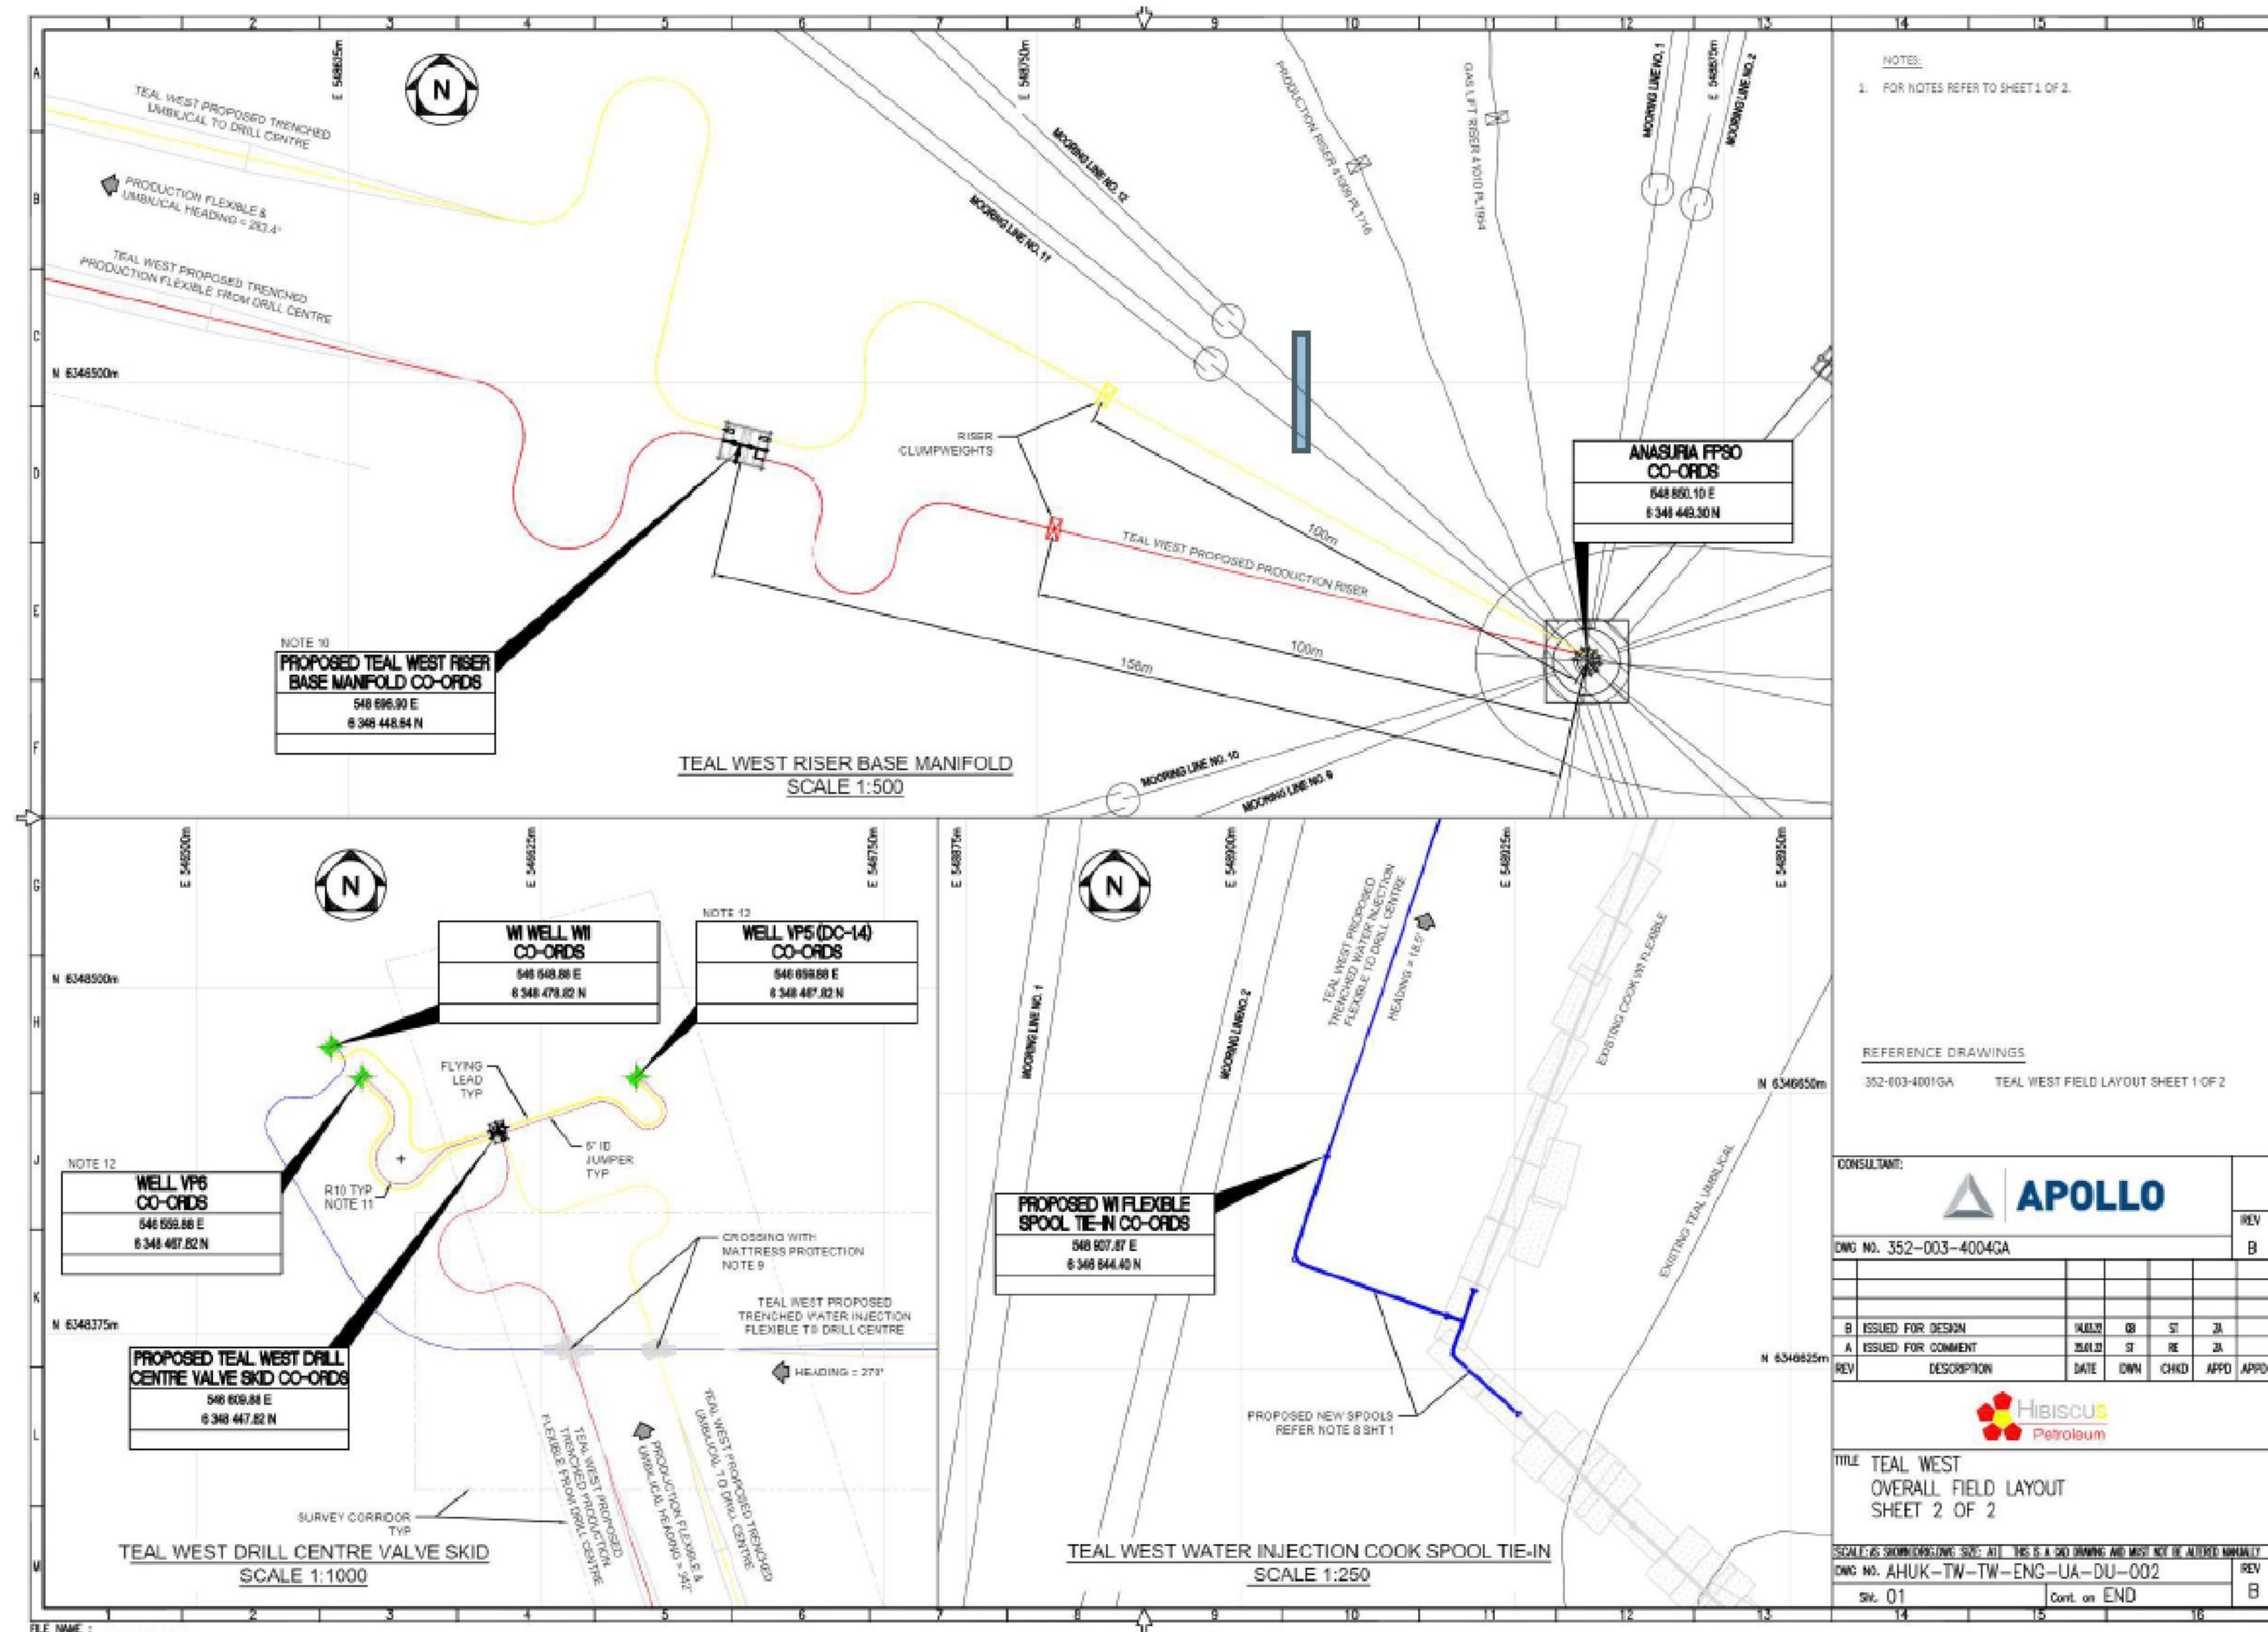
Teal West Field layout showing detail of tie-in points
